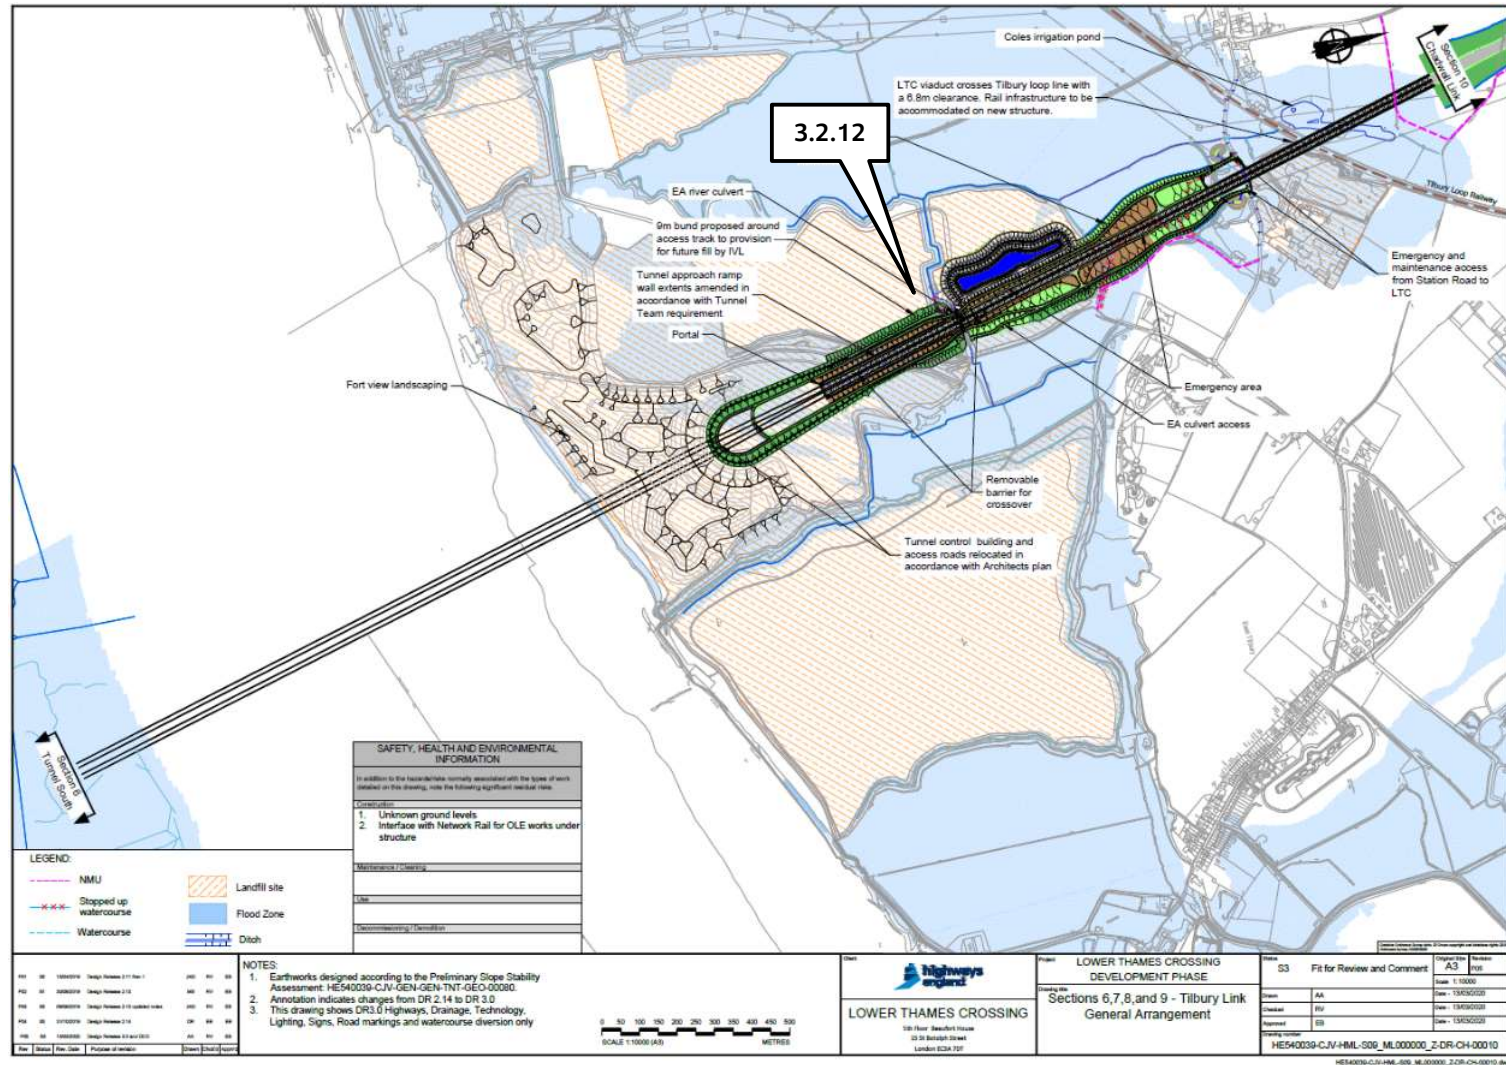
Problem location plan based on GA drawing HE540039-CJV-HML-S03_ML000000_Z-DR-CH-00050
